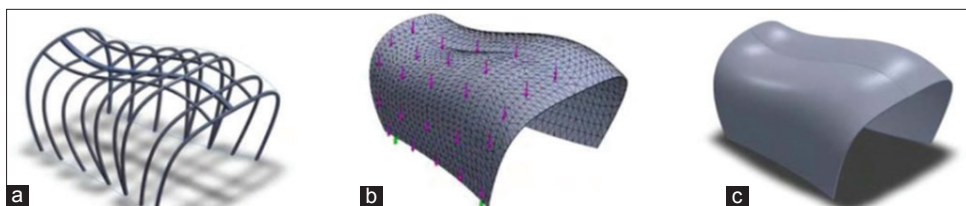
(a-c) Compressed laminated bamboo, Forest Park Pavilion, 2007, St. Louis, Missouri, USA^[39]
